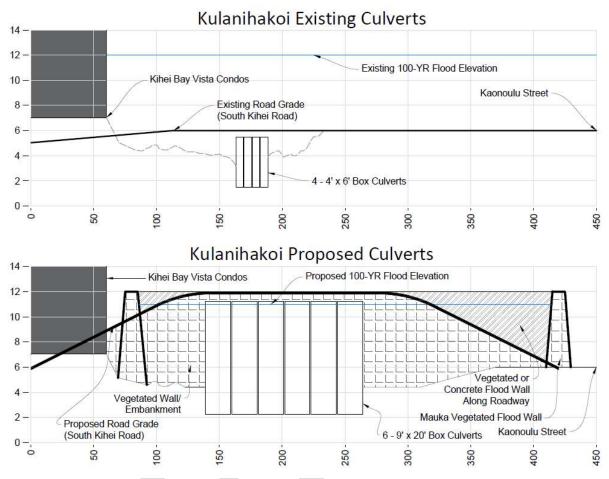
Kulanihakoi Existing and Proposed Culverts at Channel Intersection with South Kihei Road
